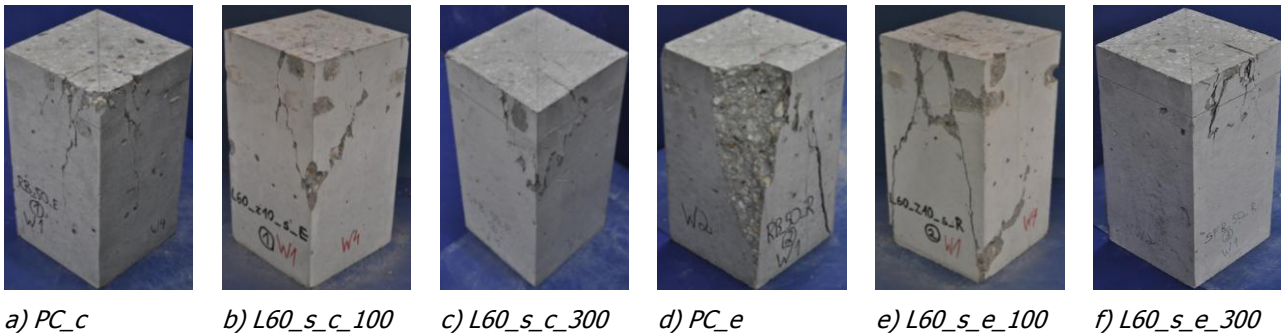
Typical examples of tested specimens produced in standing molds under eccentric loading
